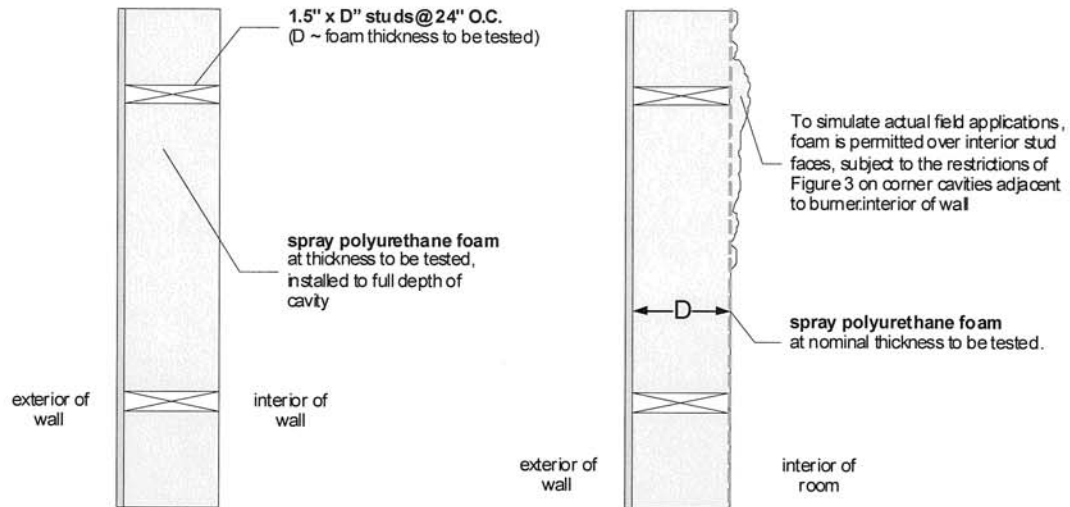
TOP VIEW OF WALL CONSTRUCTION
